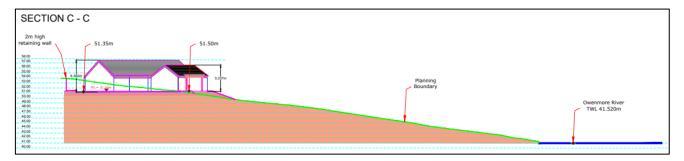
Cross Section C-C (North to South) through the site showing the slope and the site planning boundary well separated from the River Owenmore
